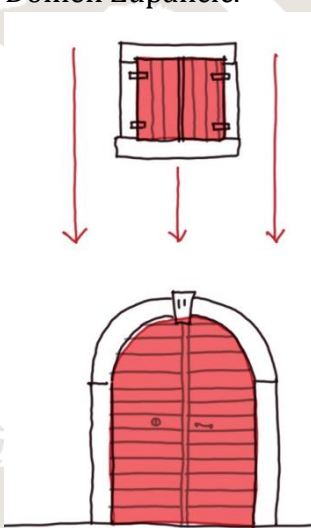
Explanation of weight repositioning combined with wall openings. Small arch redirects the weight of the wall to the sides of the opening.
